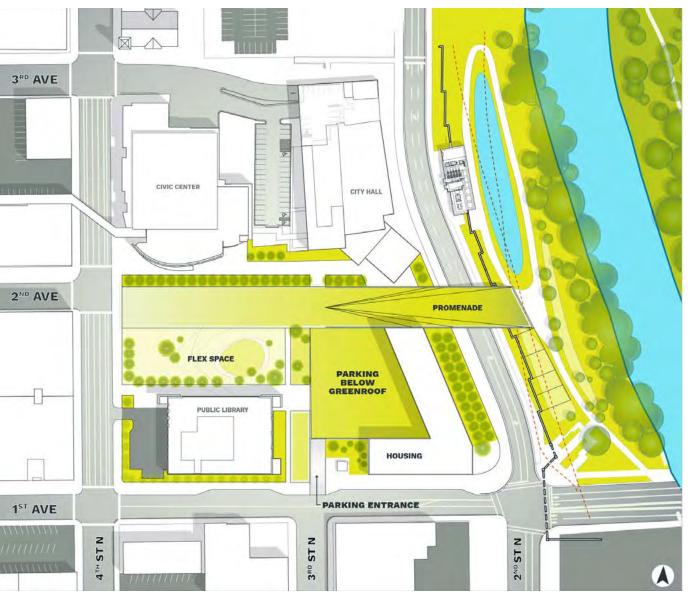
Conceptual Site Plan Alternative with Cantilevered Promenade connecting City Hall Plaza with Riverfront
